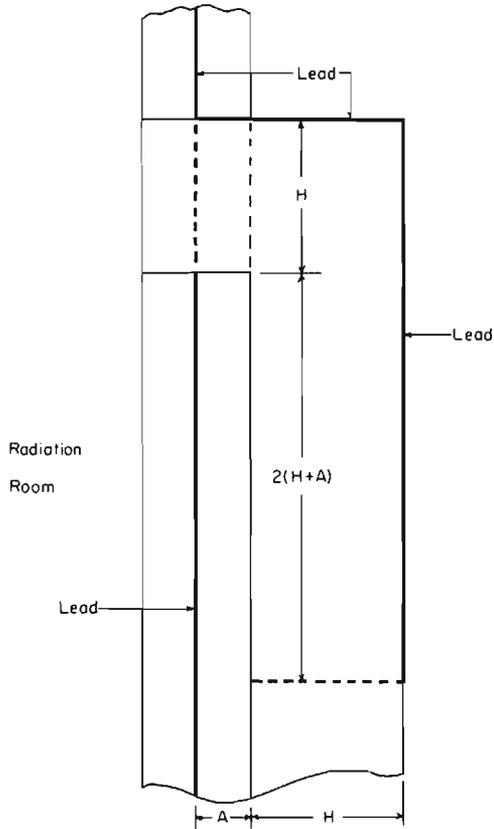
Typical baffle design for openings in secondary protective barrier.
